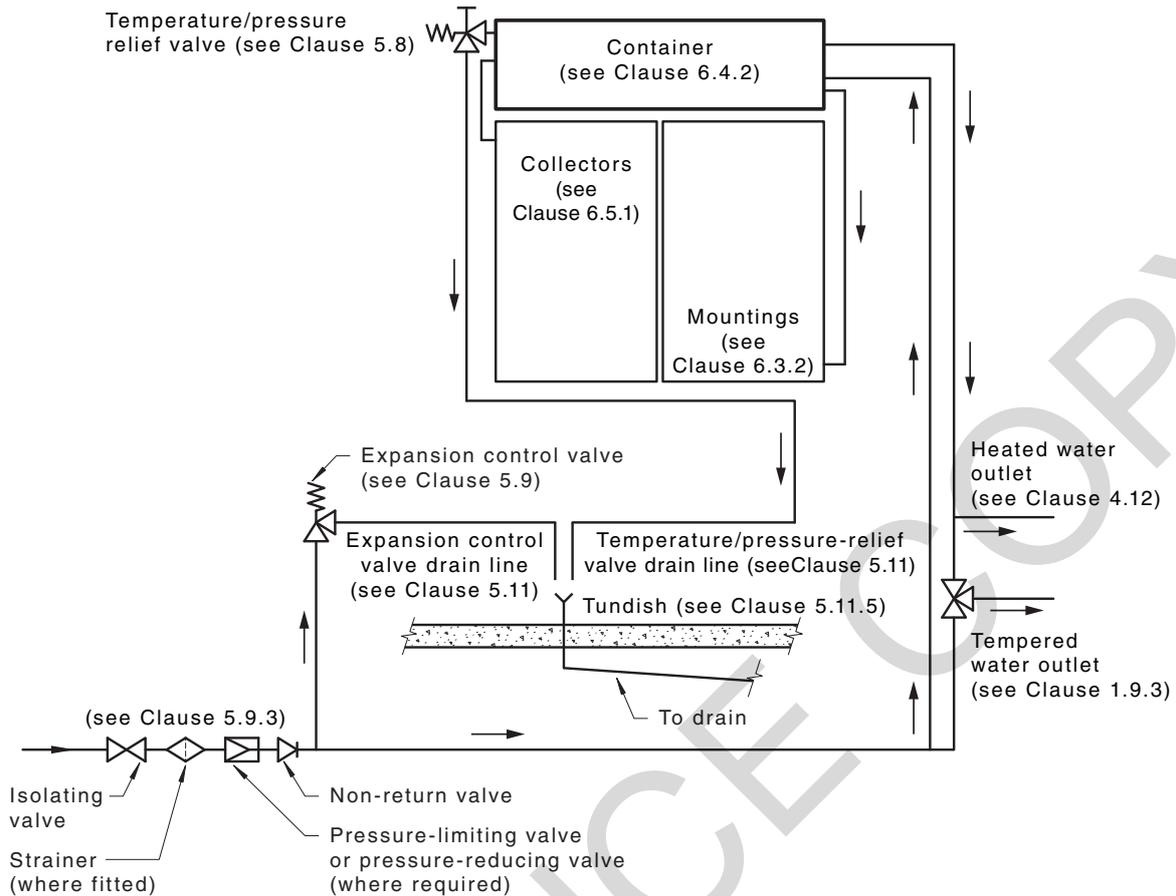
TYPICAL INSTALLATION OF CLOSE-COUPLED SOLAR WATER HEATER
